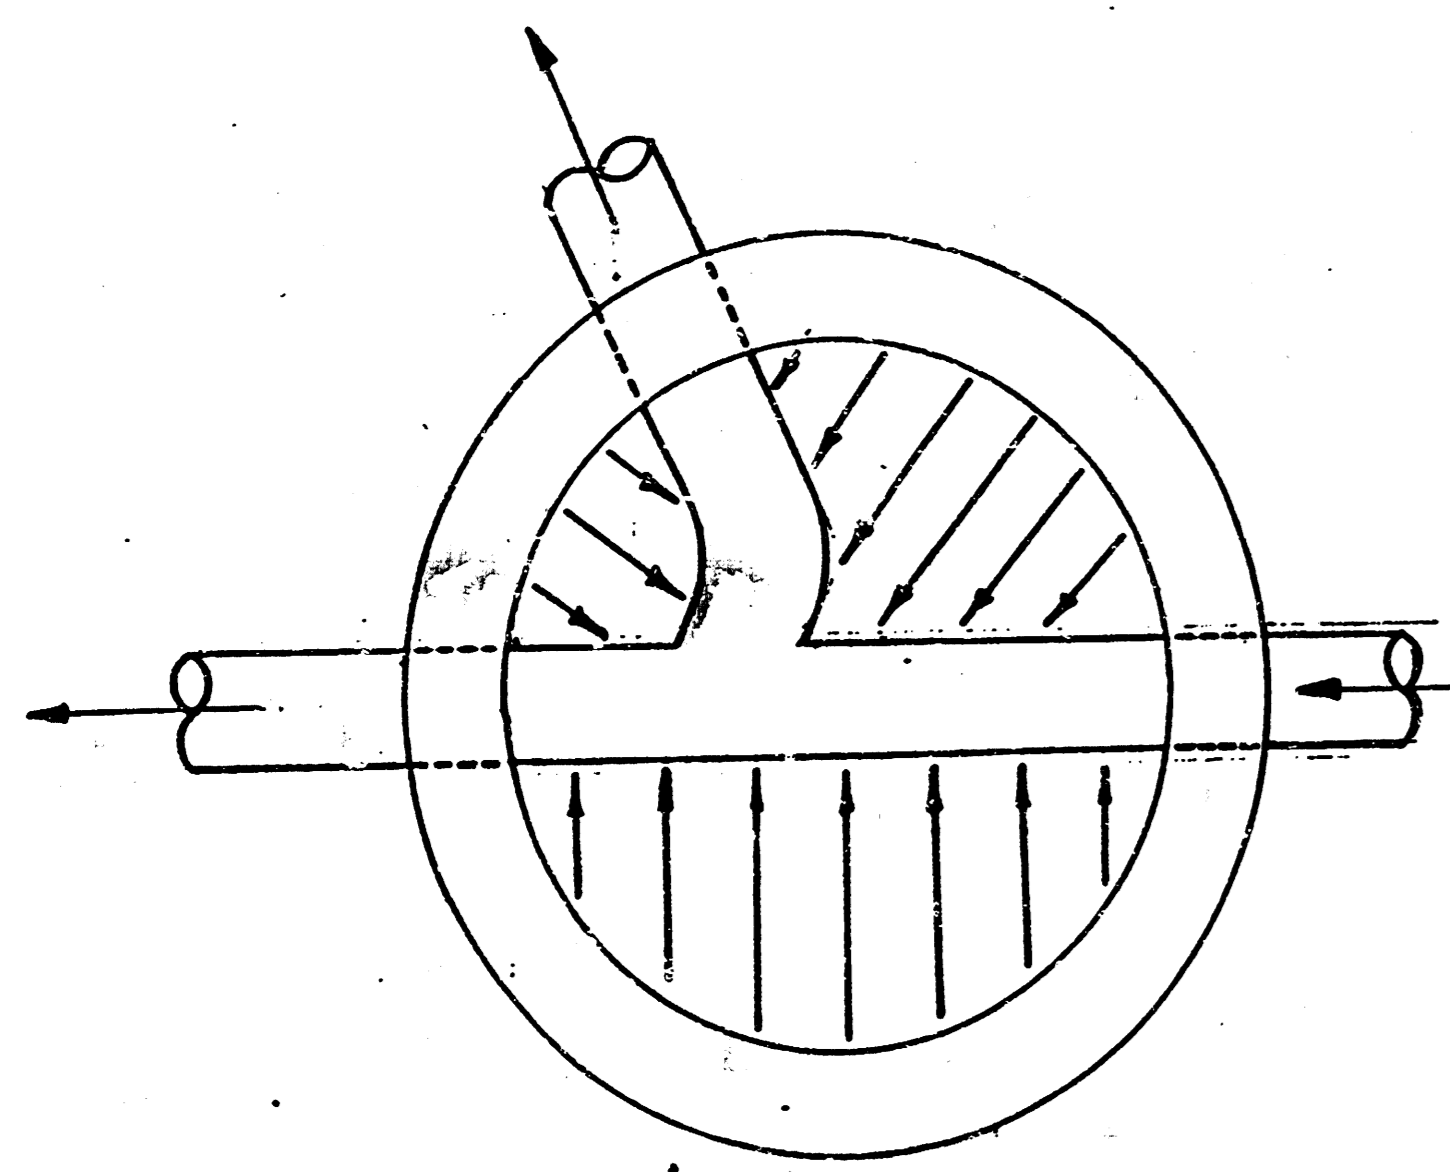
DETAIL OF OUTSIDE DRCP CONSTRUCTED ON EXISTING MANHOLE
